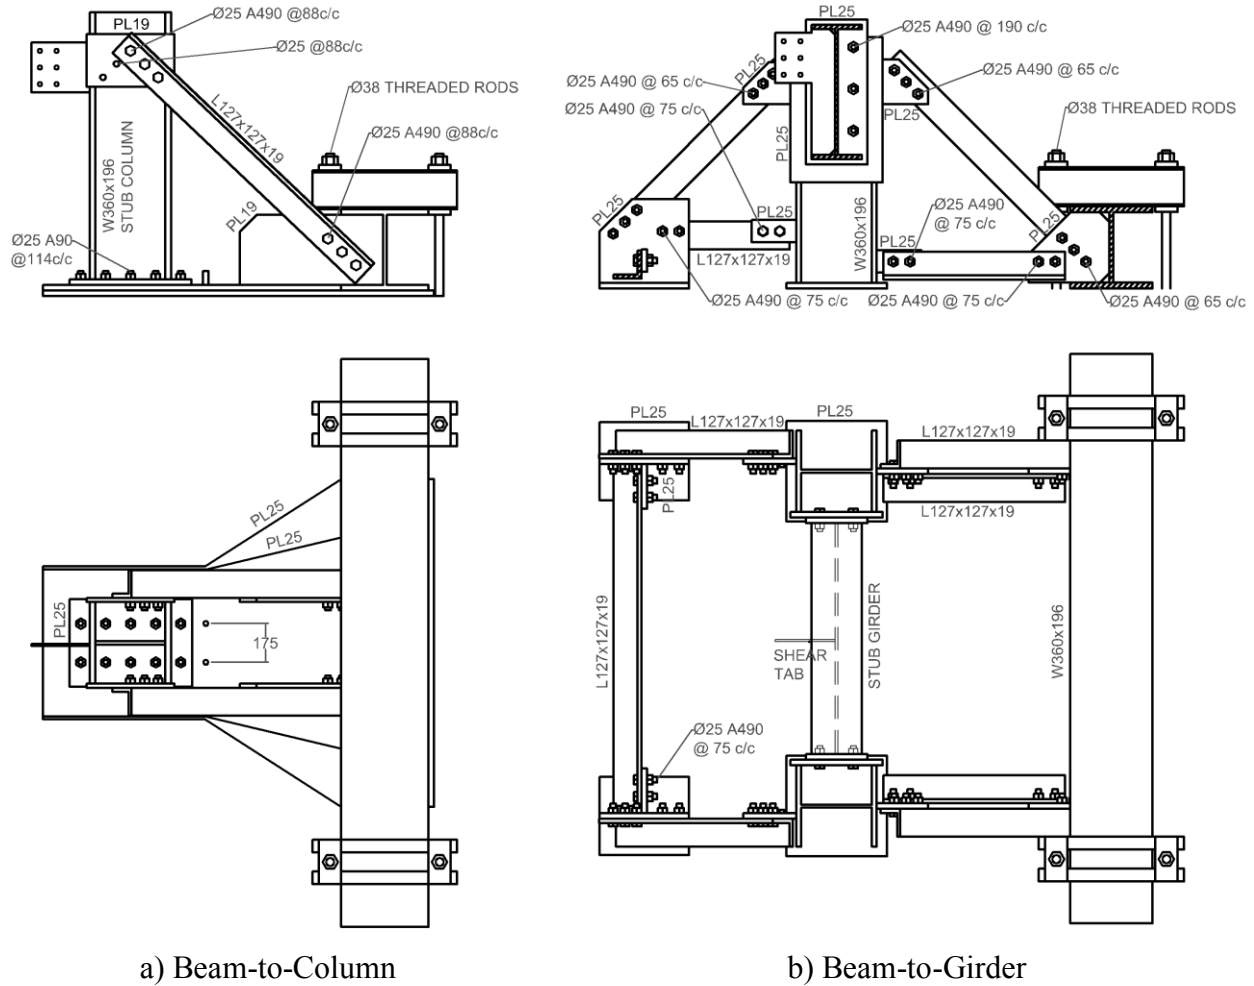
Reaction Frame Details, Elevation and Section Views; Dimensions in mm
